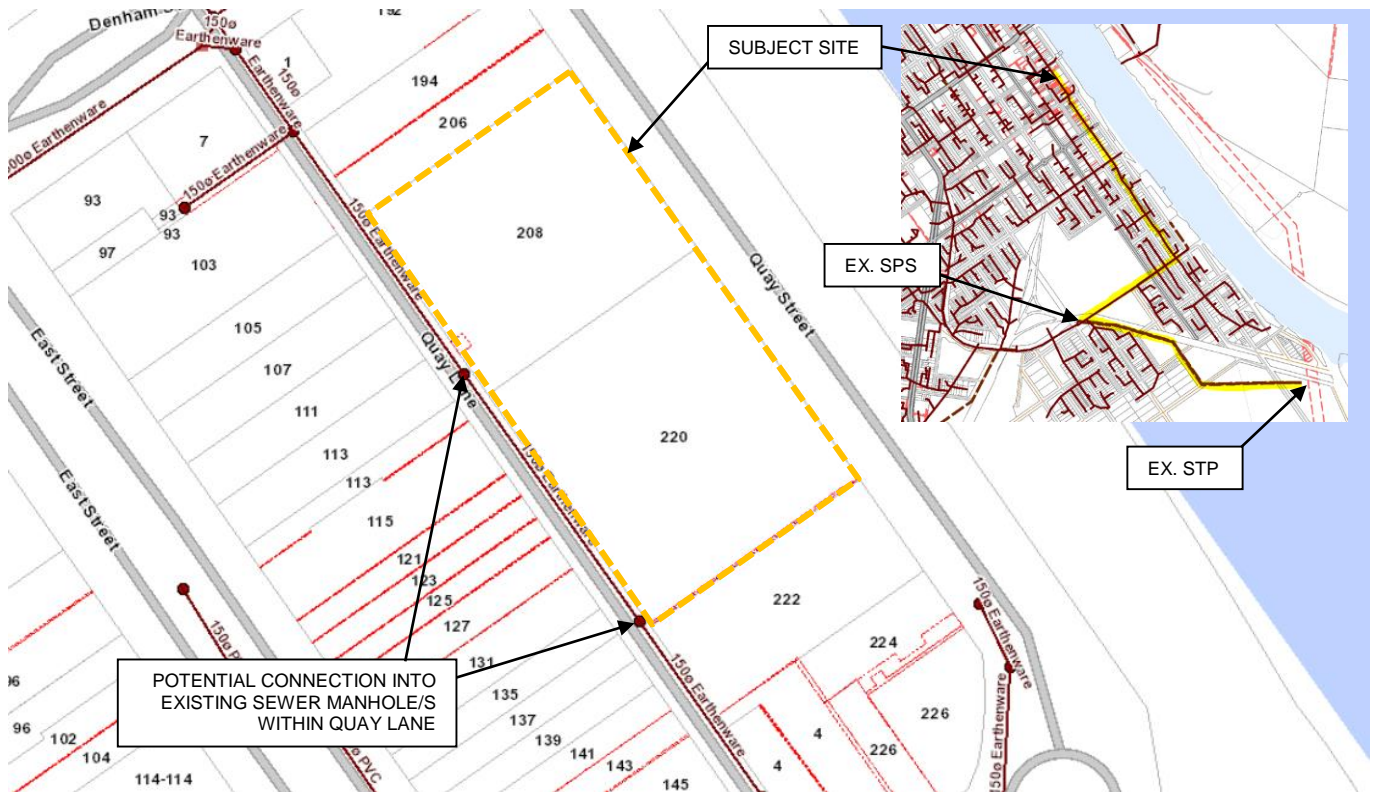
Existing Sewer Infrastructure (Rockhampton Online Mapping, 2018)
